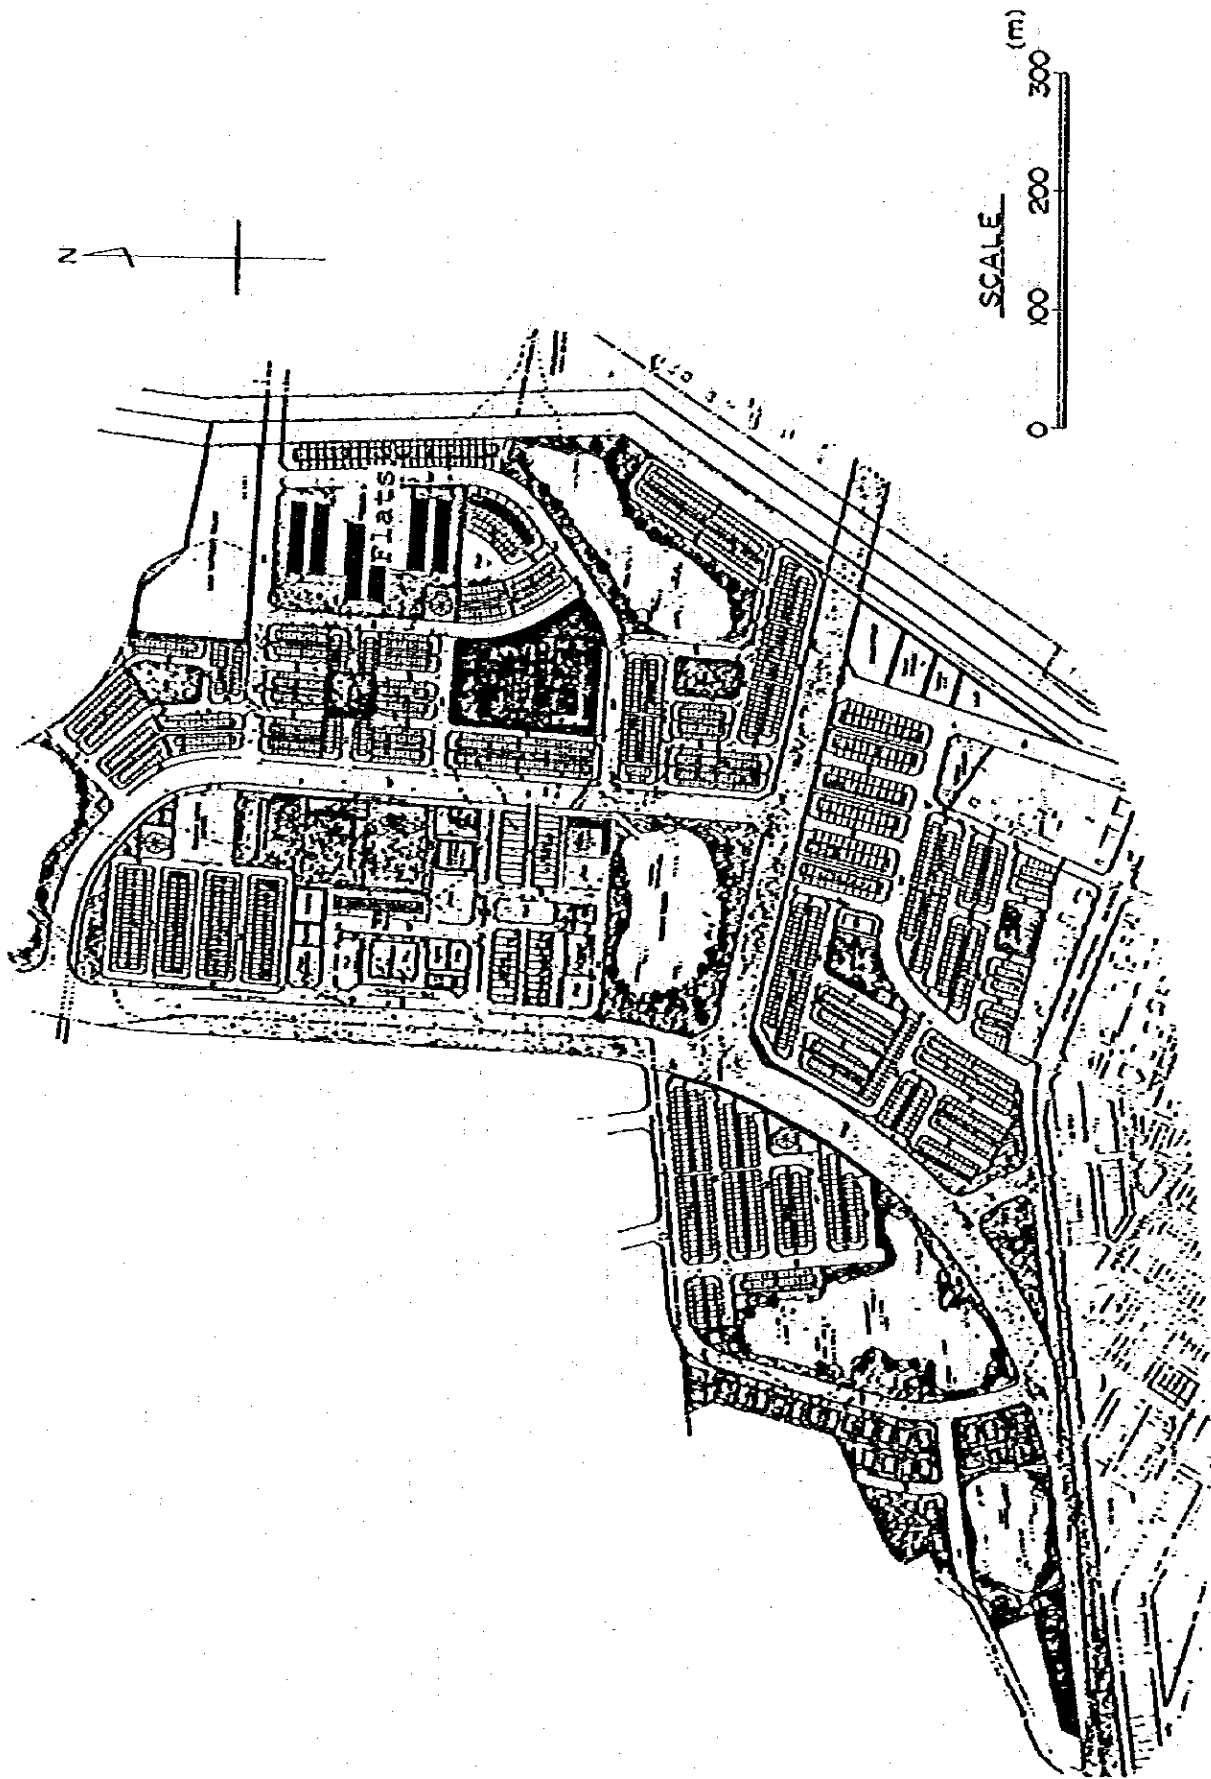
Layout Plan for Housing Development at Kampong Pandan
